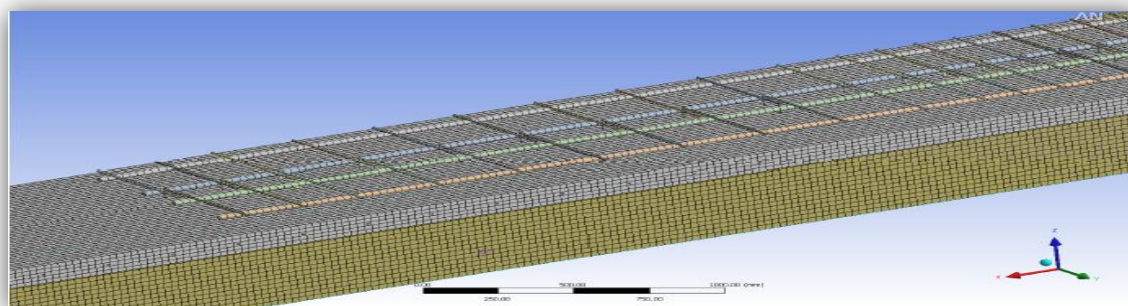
Reinforcement to structural topping (Source: Aurecon)
